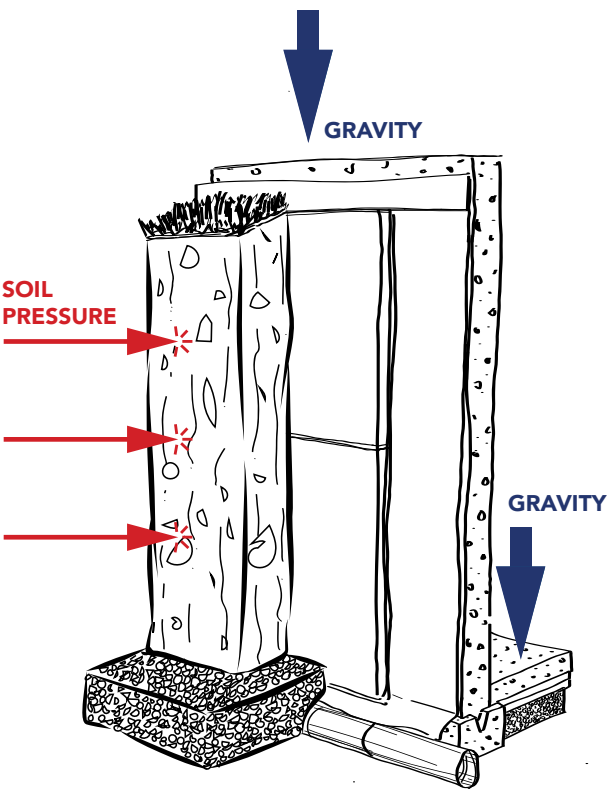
Schematic showing various short- and long-term structural loads that can act on below-grade wall and slab-on-grade assemblies
